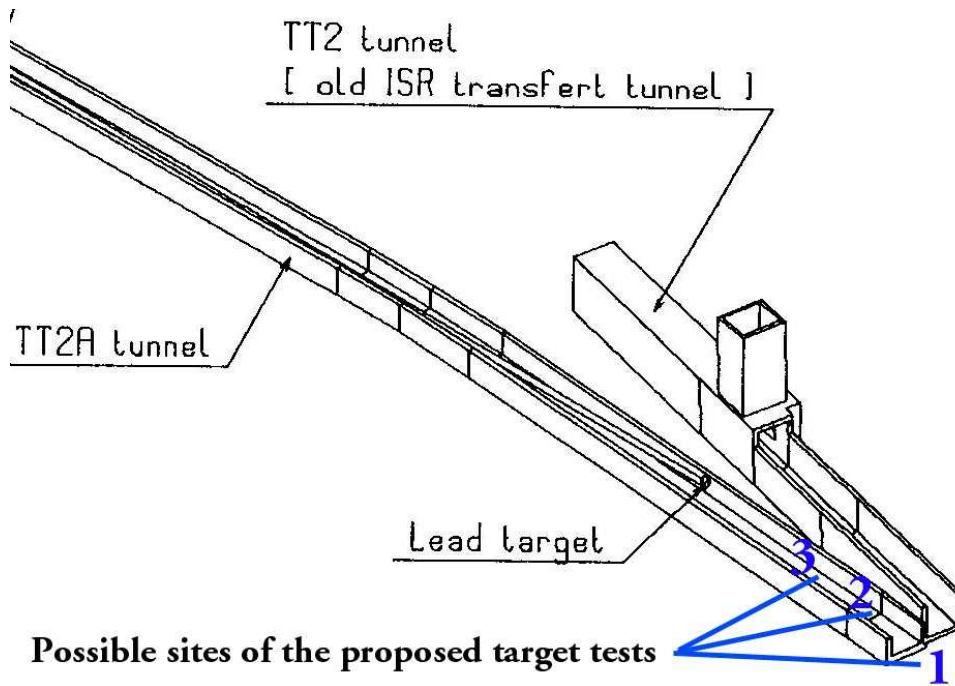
Sketch of the TT2 and TT2A tunnels. Three possible locations for the proposed target test are close to the intersection of the two tunnels. Horizontal and vertical access to these tunnels is via the TT2 tunnel. We now favor option 3, followed by option 2.
